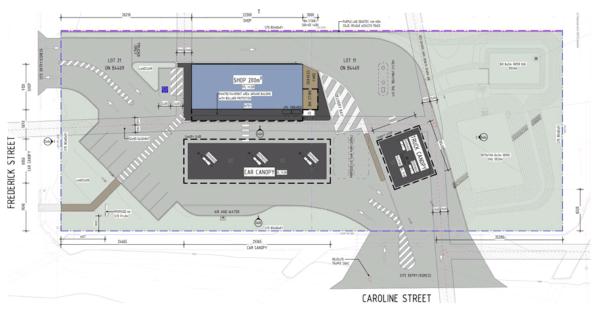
PROPOSED DEVELOPMENT LAYOUT
